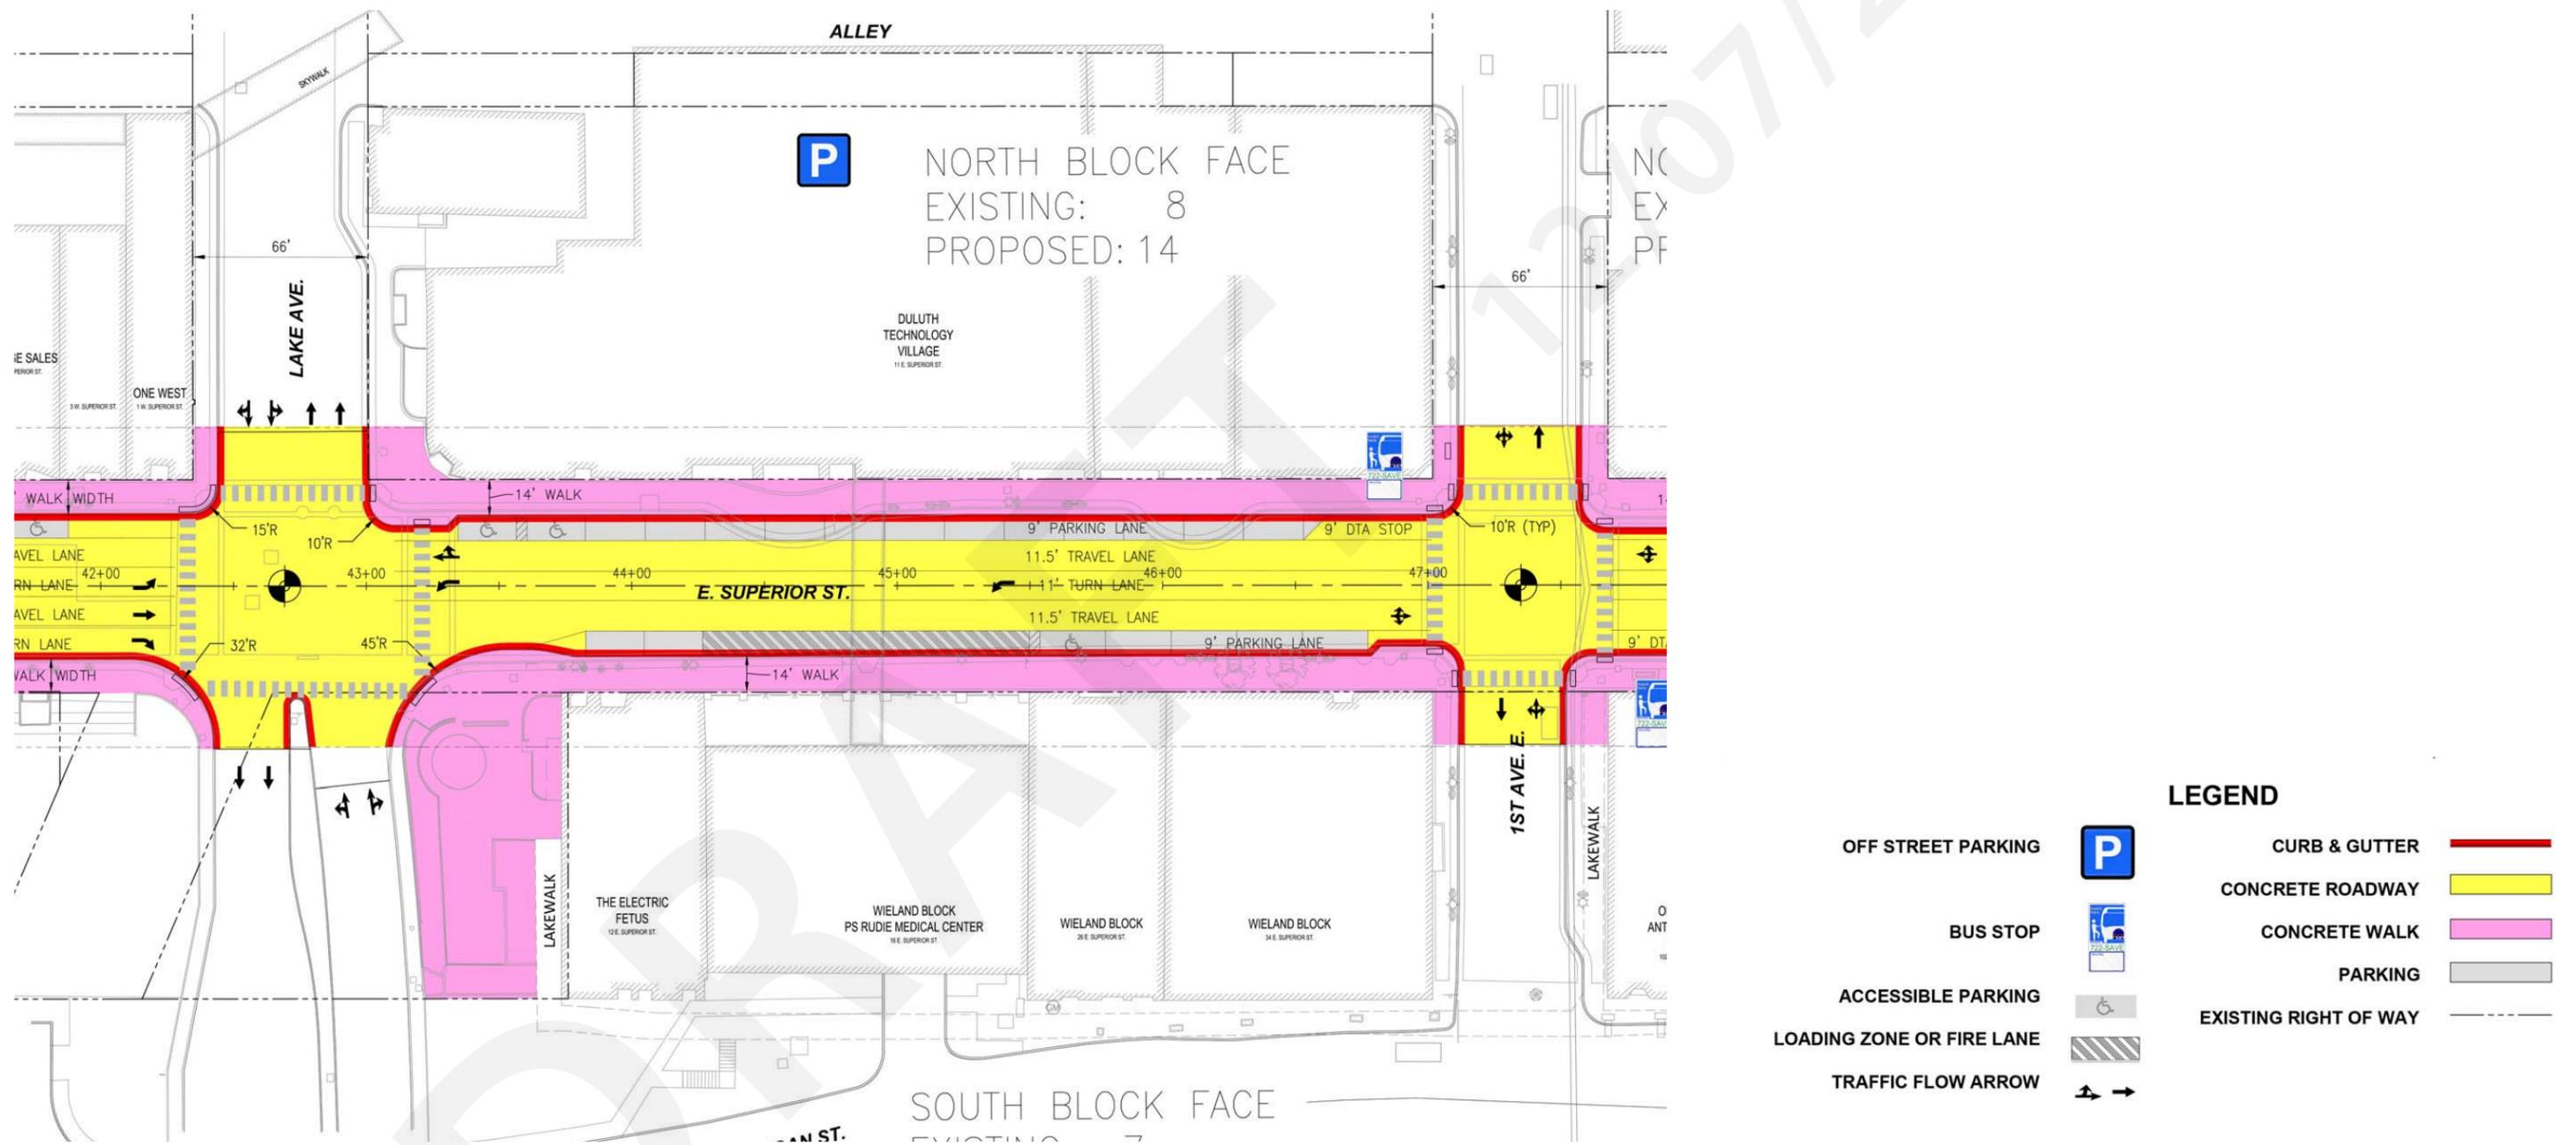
Proposed street layout between Lake Avenue and 1st Avenue East.
